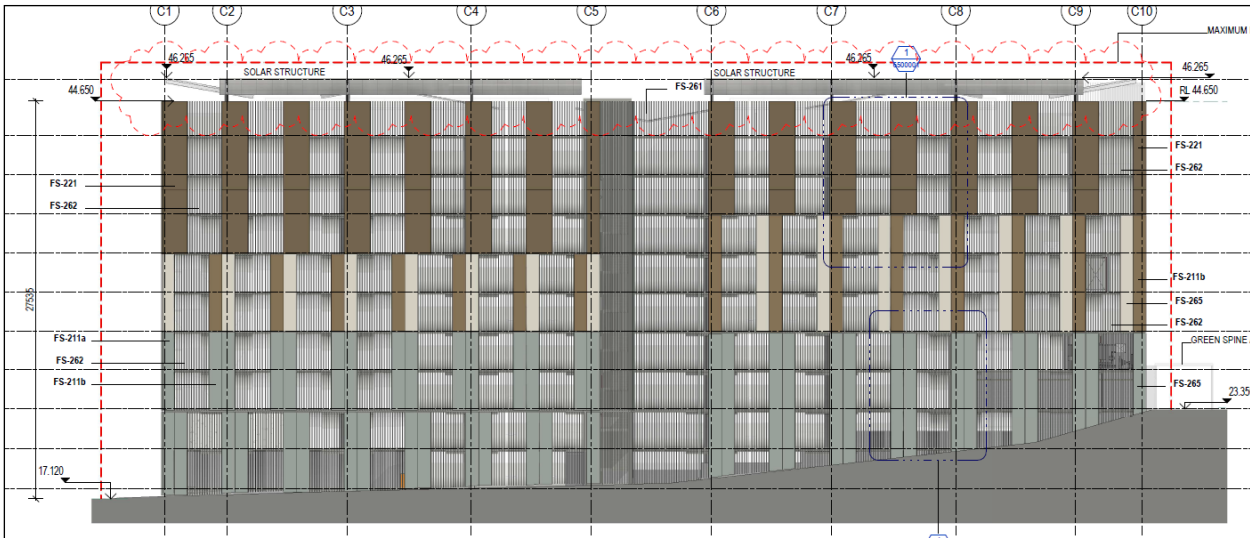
| Original approved façade for the southern elevation of the multi-deck carpark (Source: SSD-10353 approved plans)
